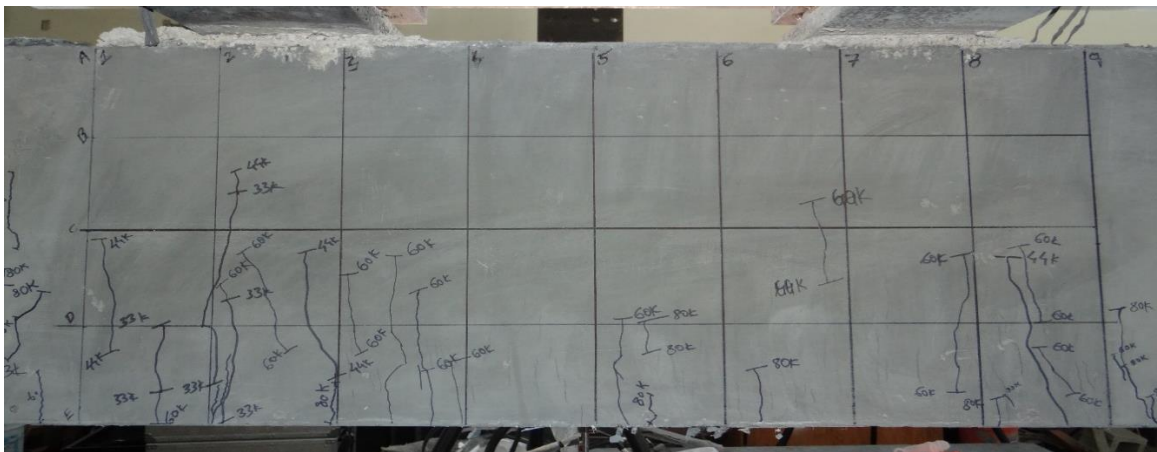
Cracking patterns for beam specimens UHP-FRC/FRP1 at 82 kips
